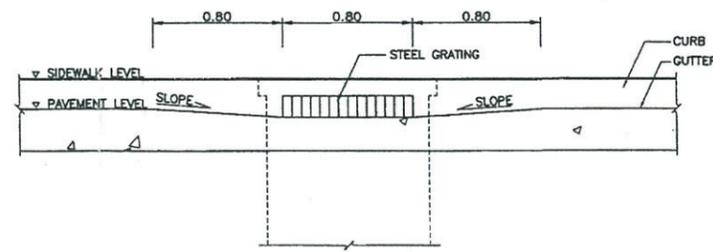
DETAIL OF CURB AND GUTTER OR CURB AT RAISED MEDIAN
